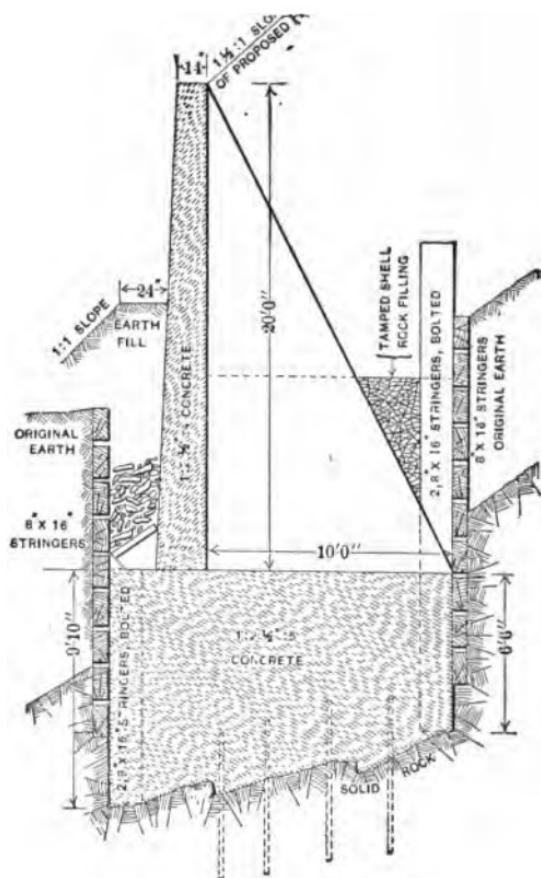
Section of Retaining-wall, Trench, and Timbering.
